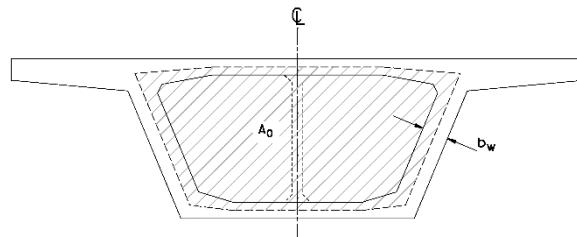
Area Enclosed by Shear Flow Path and Web Width for Single Cell Box and Symmetrical Two-Cell Girder Superstructure
